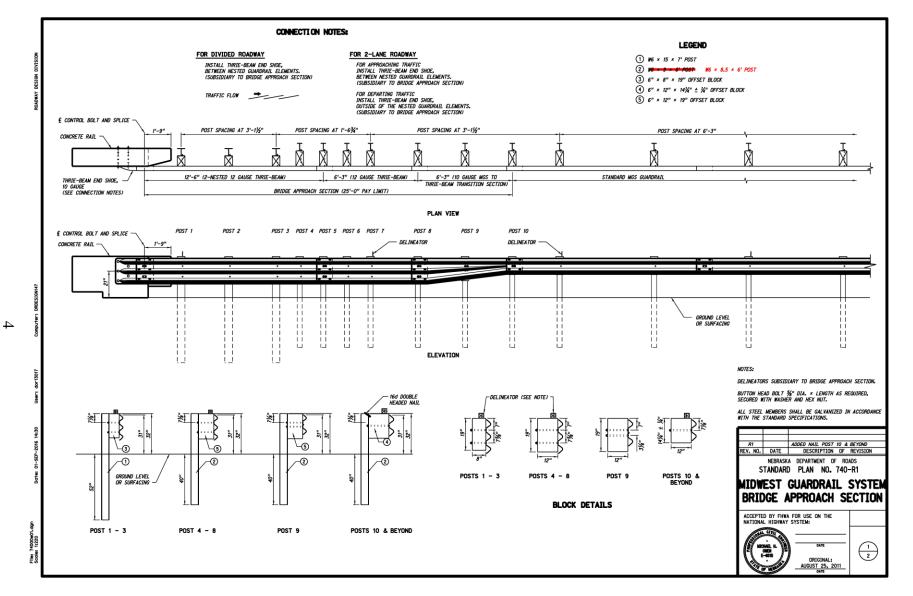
NDOT Approach Guardrail Transition Standard Plan [20]
